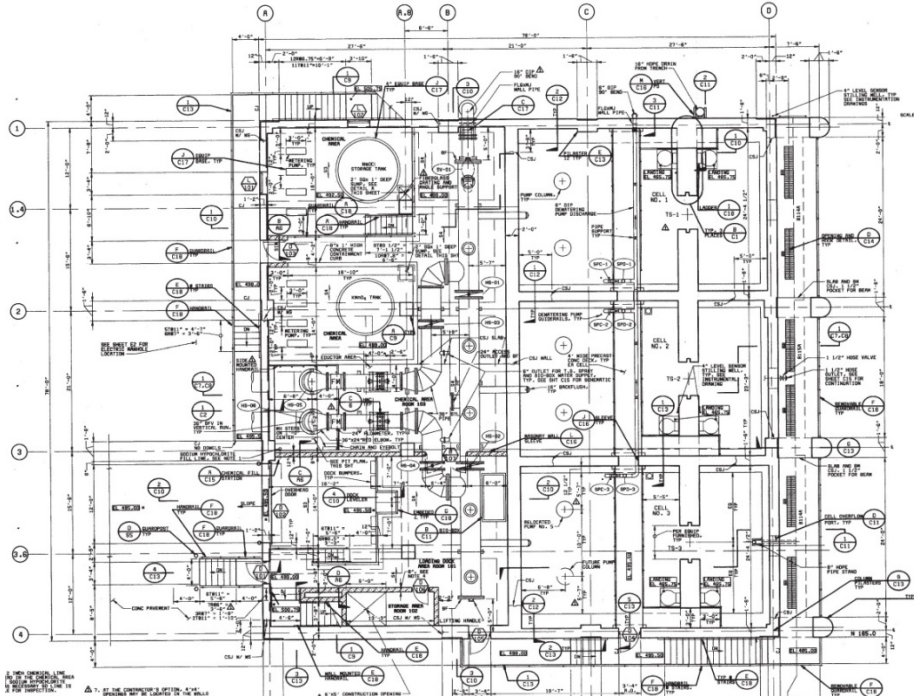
ORPS 1 Intermediate Floor Plan View
